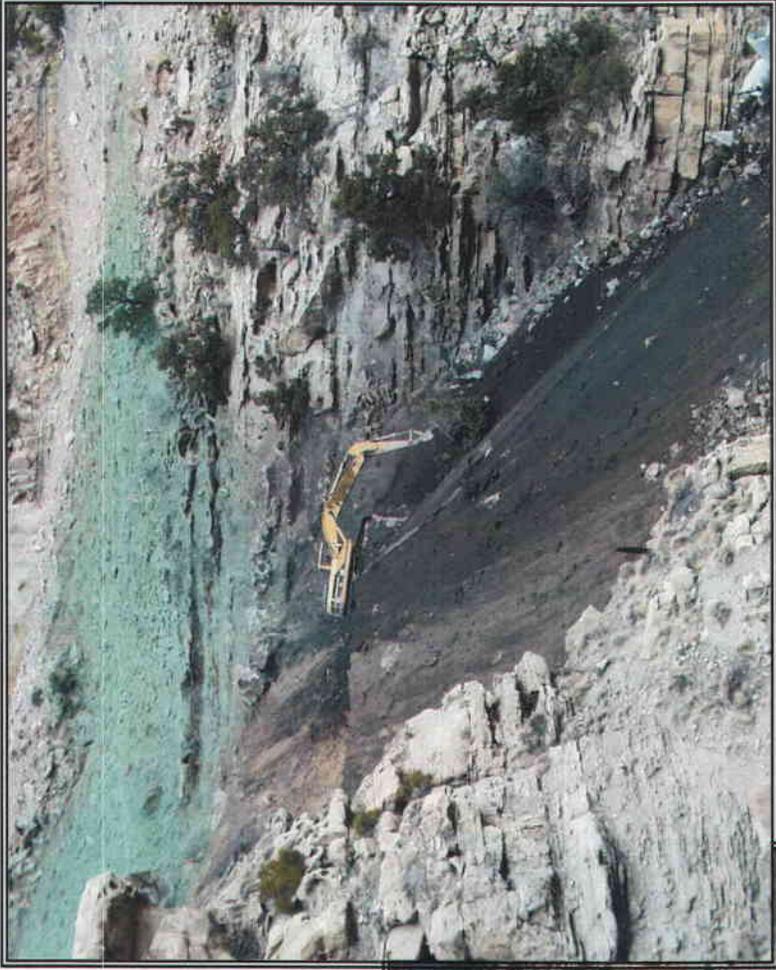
Substitute topsoil excavated from trench on bathroom pad. Trench is backfilled with coal waste.
